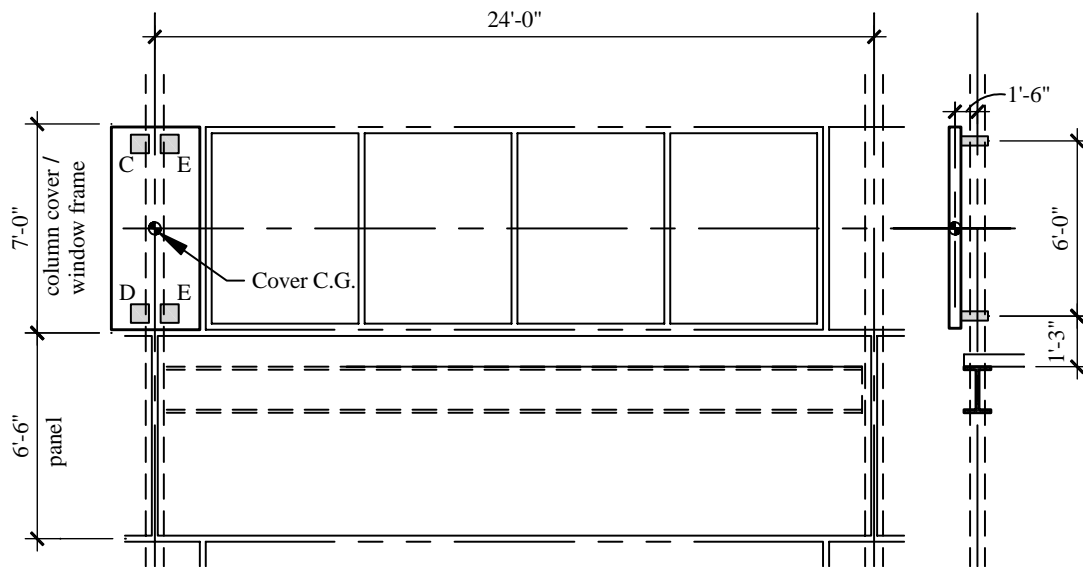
Column cover connection layout (1.0 ft = 0.3048 m).
